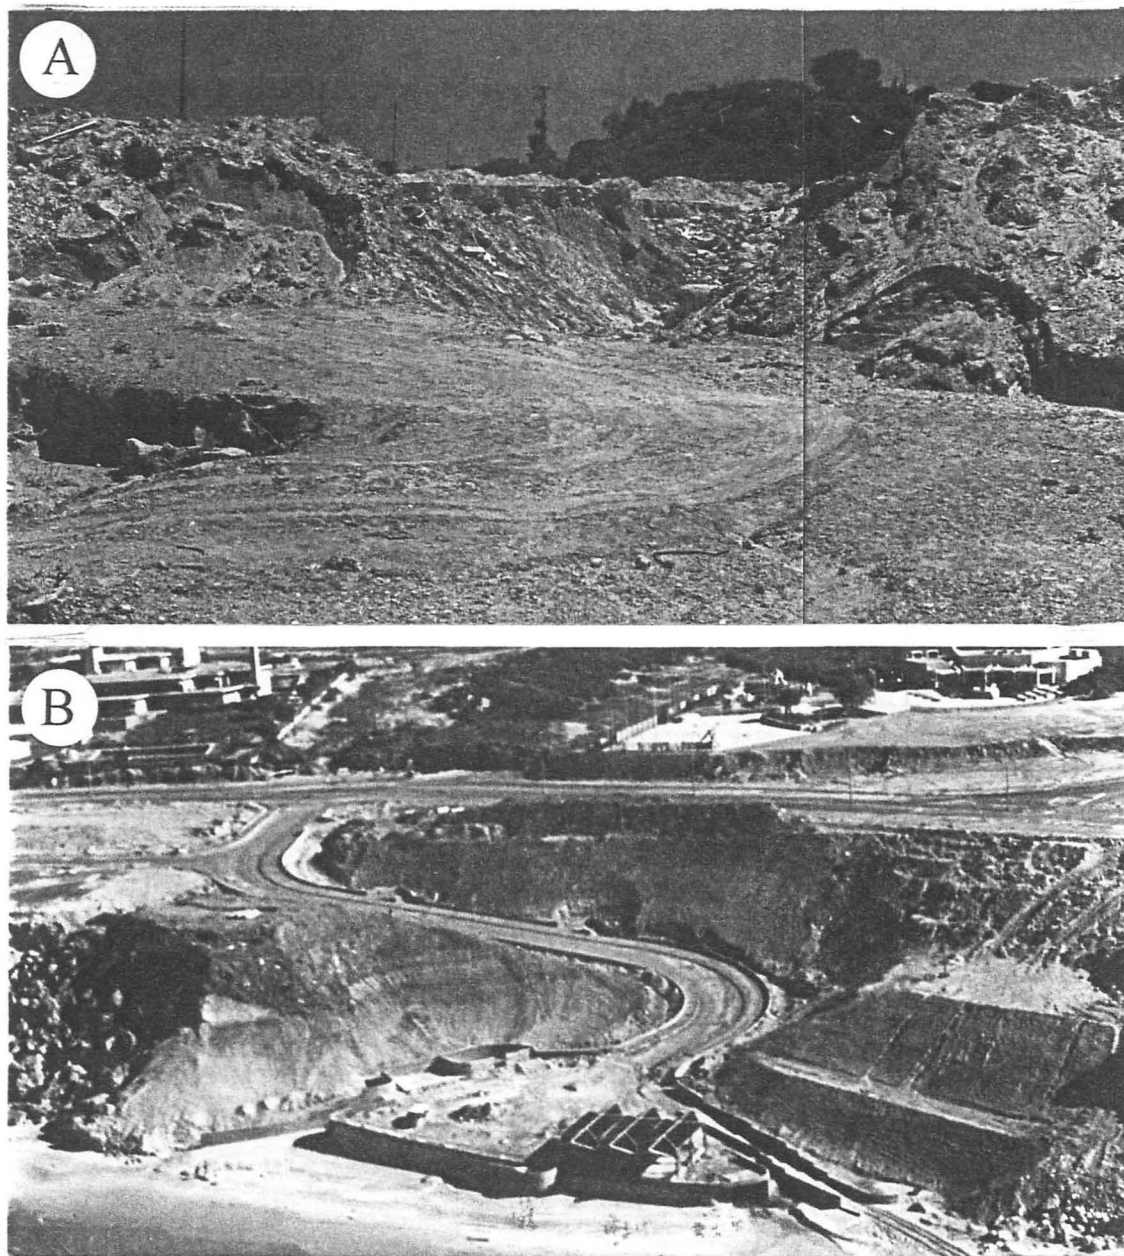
A. Heavy erosional damage to artificial road and parking lots built on an artificial fill of previous erosion gap.
